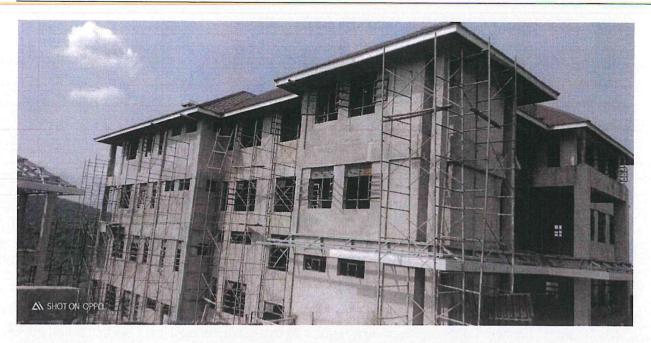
Work in progress at CWSK Murang'a Foster Care (Floor Elevation)
